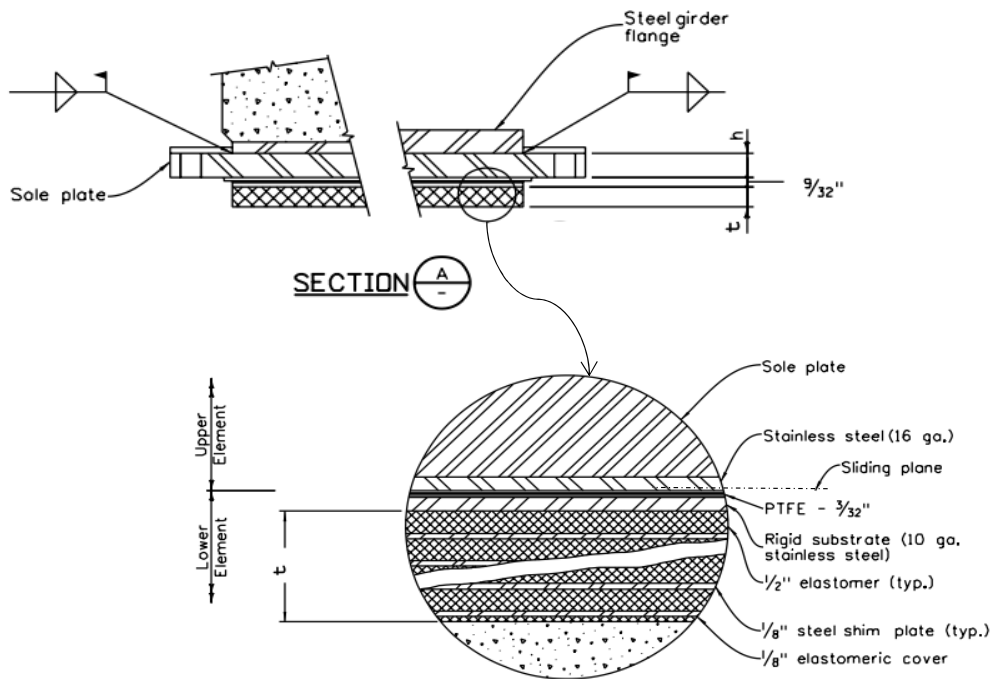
TYPE II - STEEL REINFORCED BEARING PAD WITH PTFE - SECTION
